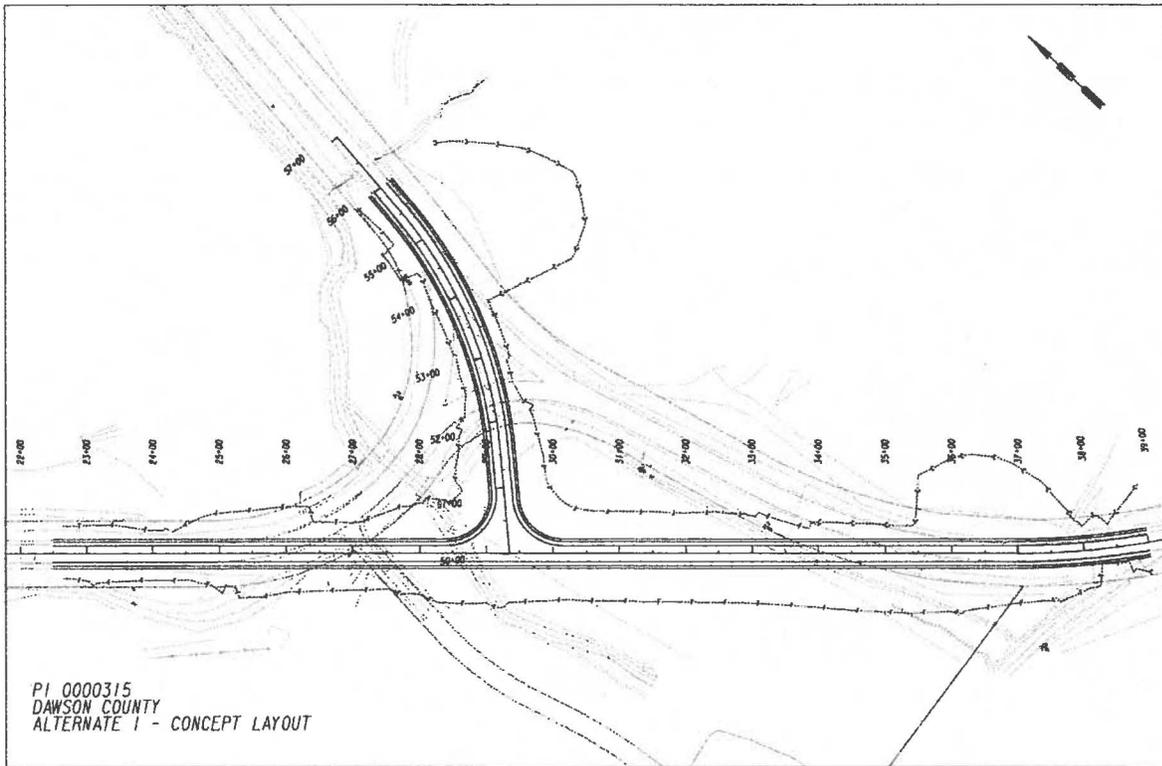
Alternate 1, T-Intersection to West of Existing Y-Intersection
